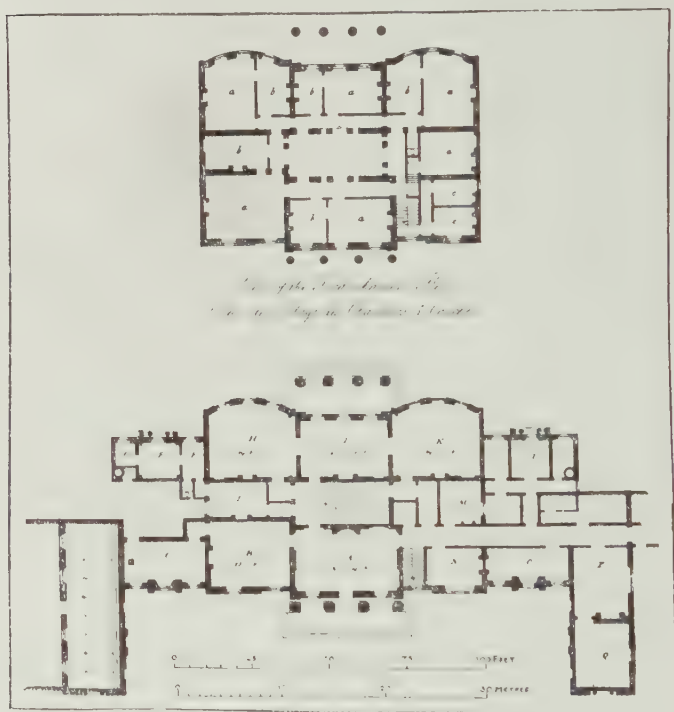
Ground and First Floor Plans, Silwood Park, Berkshire.
